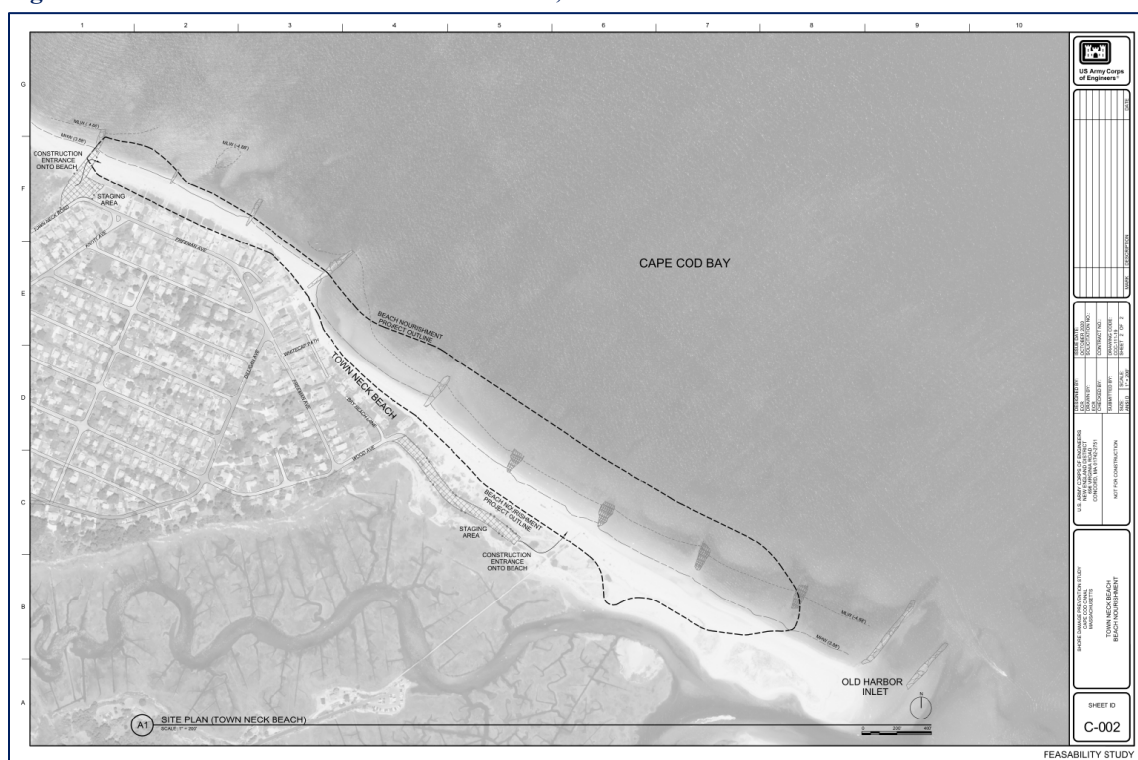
Alternative 1A, Town Neck Beach beach nourishment plans
